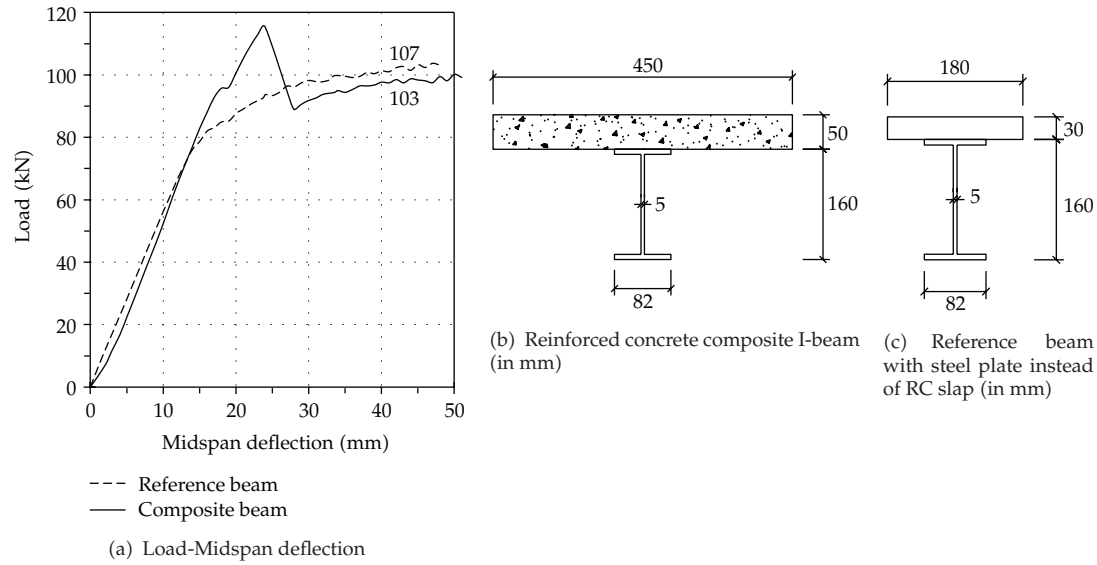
Comparison of beams with a reinforced concrete slab and a steel plate slab.
